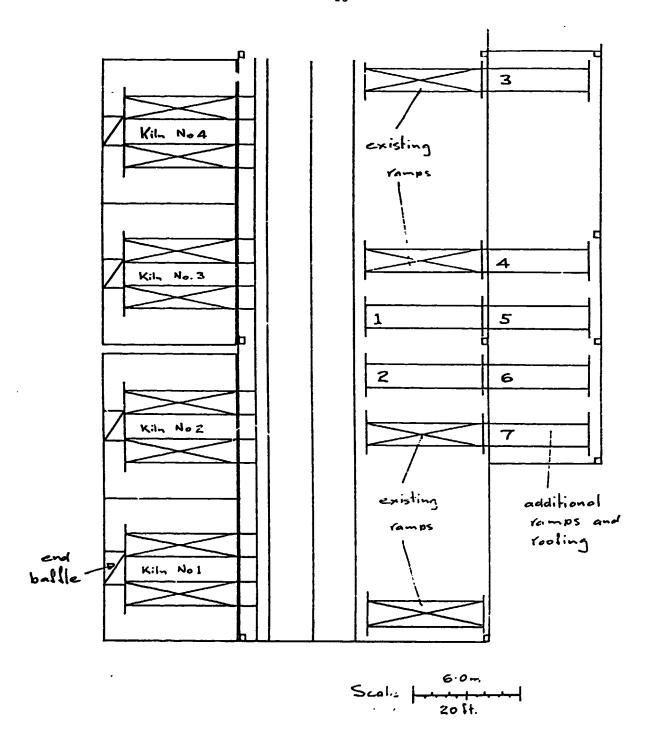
Plan of GWMC seasoning kilns (with end baffles installed) showing four existing stacking ramps and seven additional ramps and roofing, for air seasoning.
